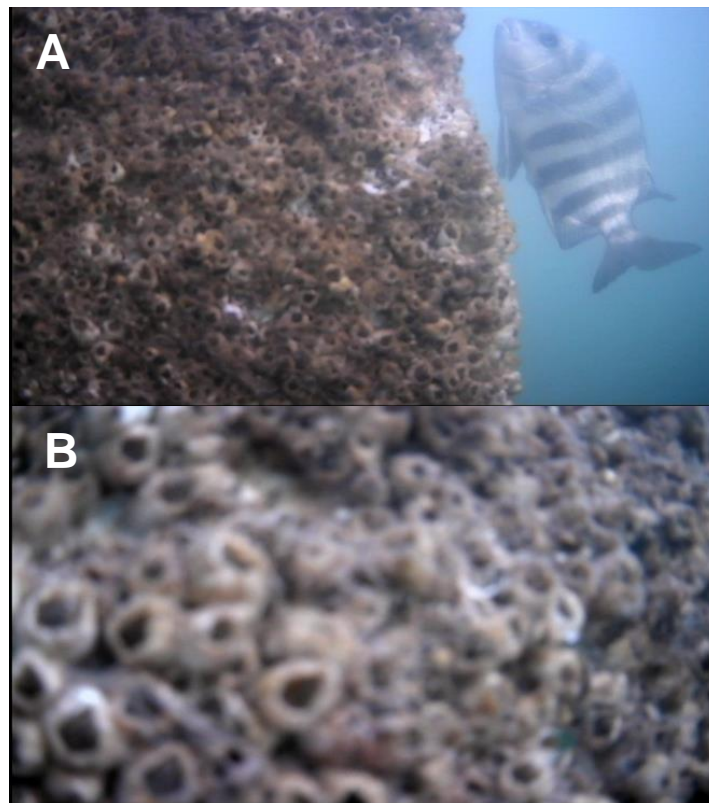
Underwater Images of Concrete Piles (Site 3).
